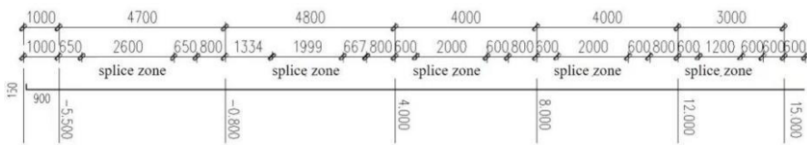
Connecting area and non-connecting area of column longitudinal bar.
